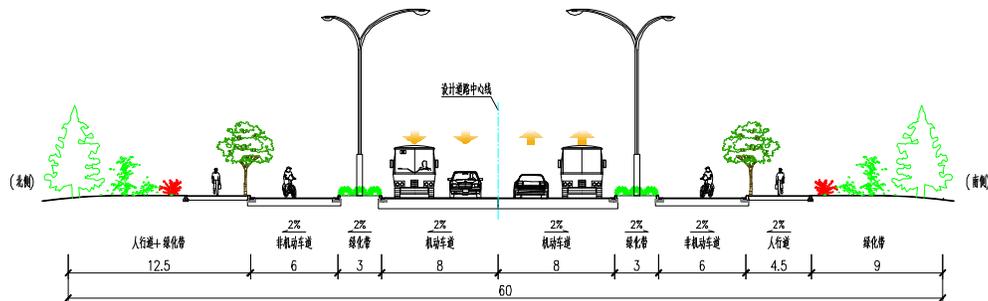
Current profile for Hubin Road ~ Taijiao railway
